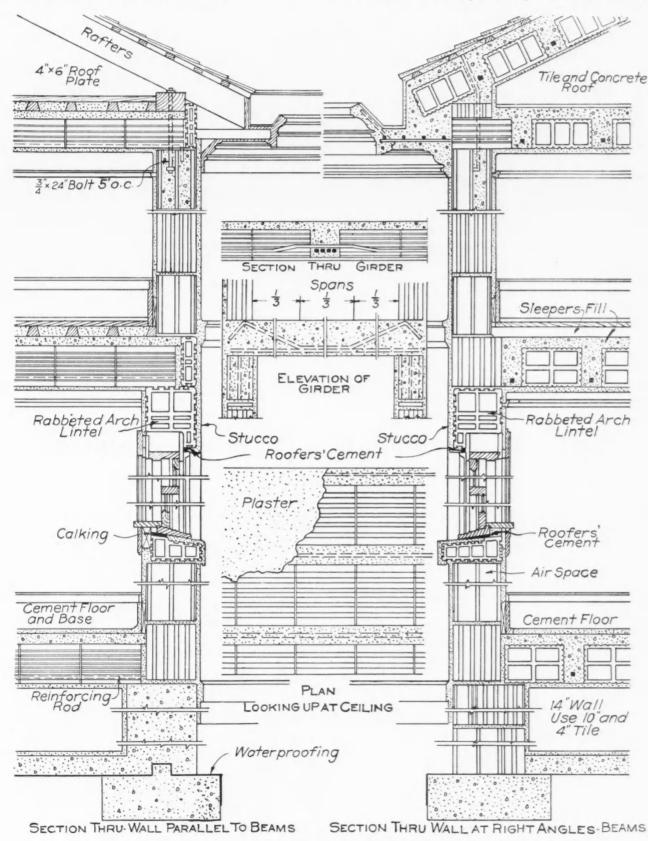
Detail Showing Relation Between Tile Walls and Tile and Concrete Floors and Roof, Also Timber Roof.
